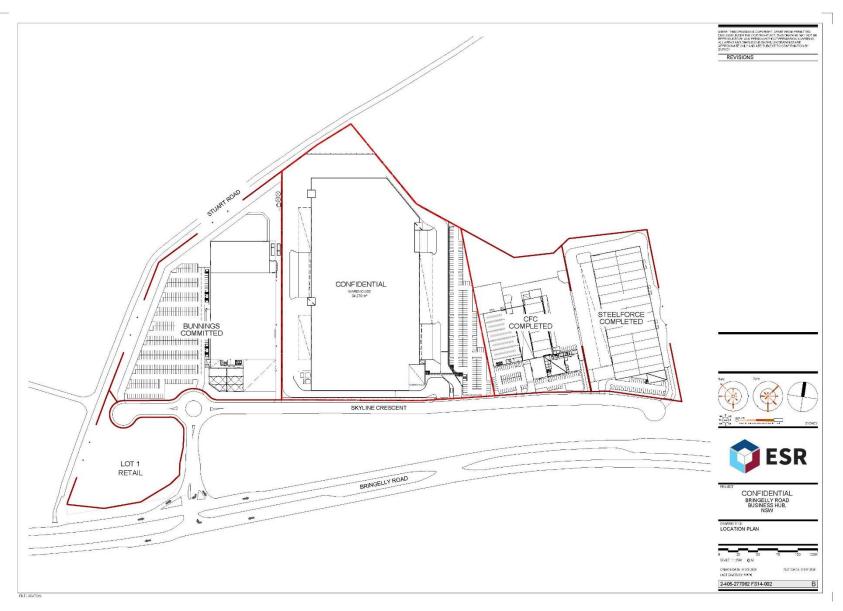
Proposed site plan – development in the context of the Bringelly Road Business Hub.
